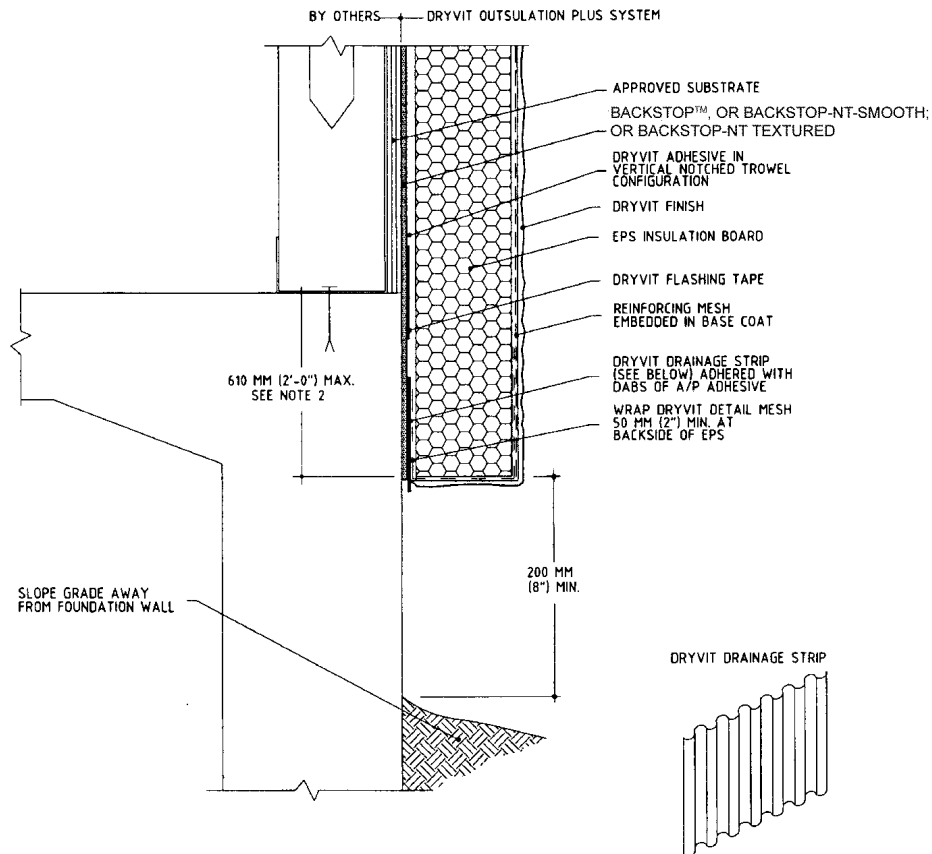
FOUNDATION WITH DRAINAGE STRIP
